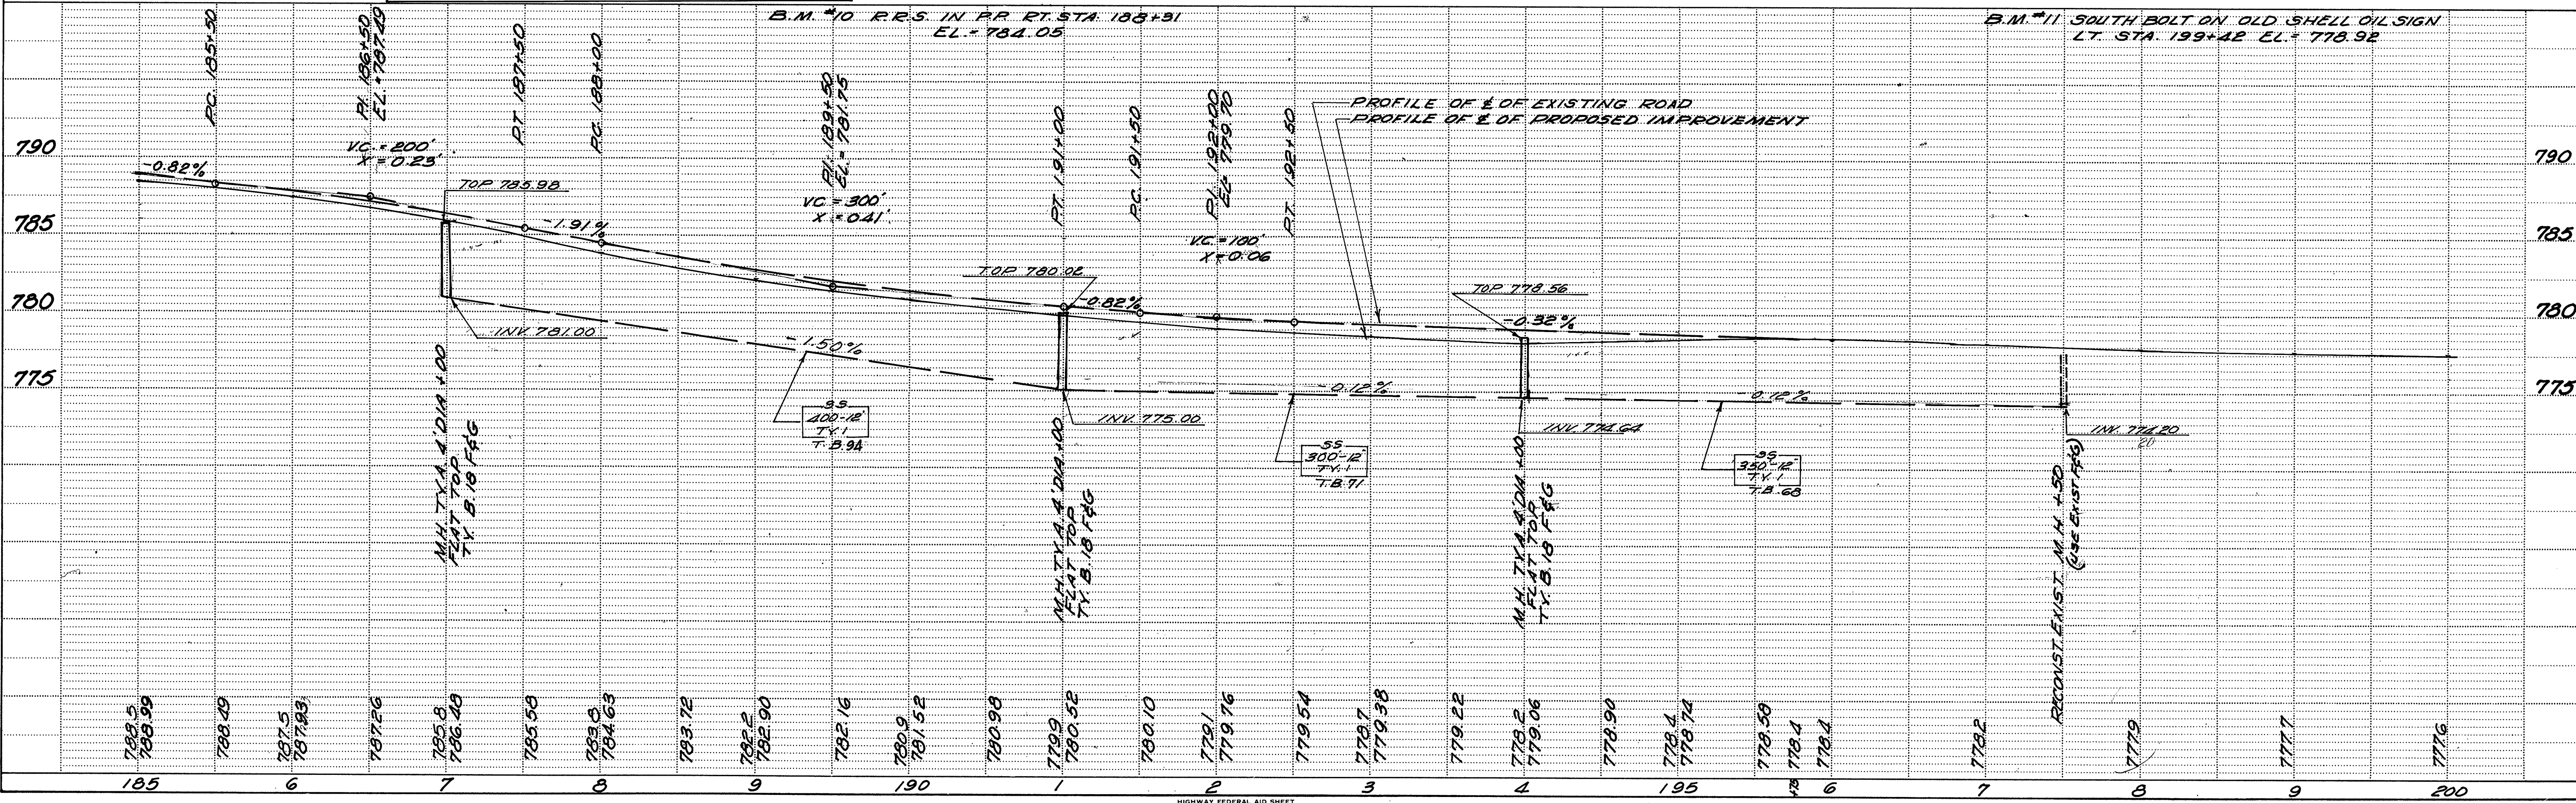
SINGLE PLAN AND PROFILE-FULL DOT
